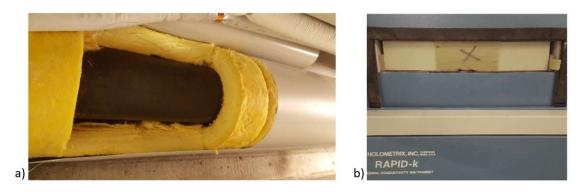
a) The pipe after removing a piece of insulation. b) Part of the removed piece of insulation (x) when tested in the GHFM.
